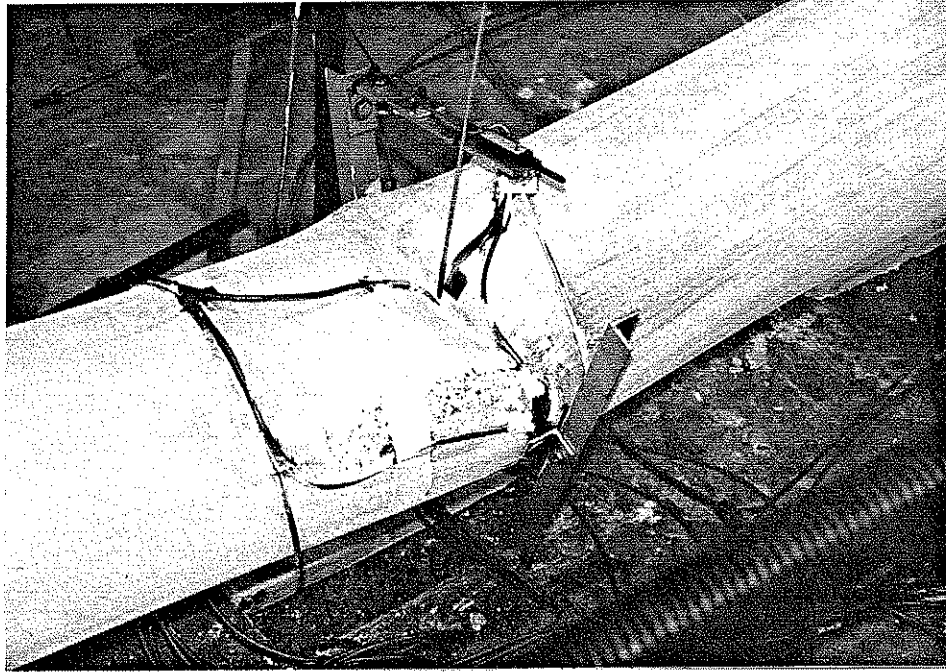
View of the deformed cross section after failure of Specimen A2.
